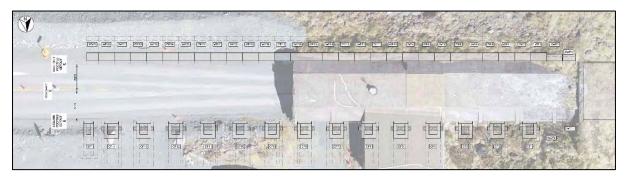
Design drawing showing the substantial footings along the northern edge of the shelter (at the bottom of image, not to scale).⁷³
